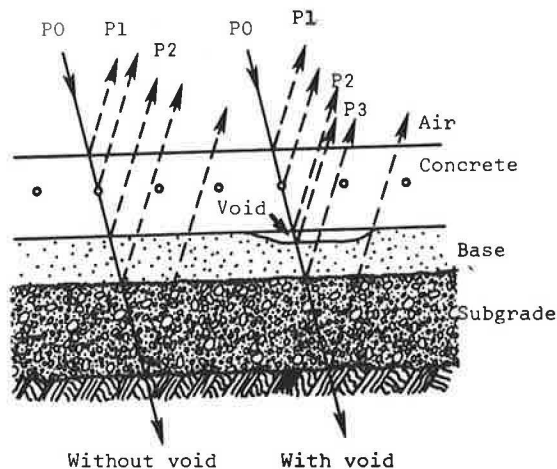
Propagation of microwave pulses through a concrete pavement without and with a void under the concrete slab.
